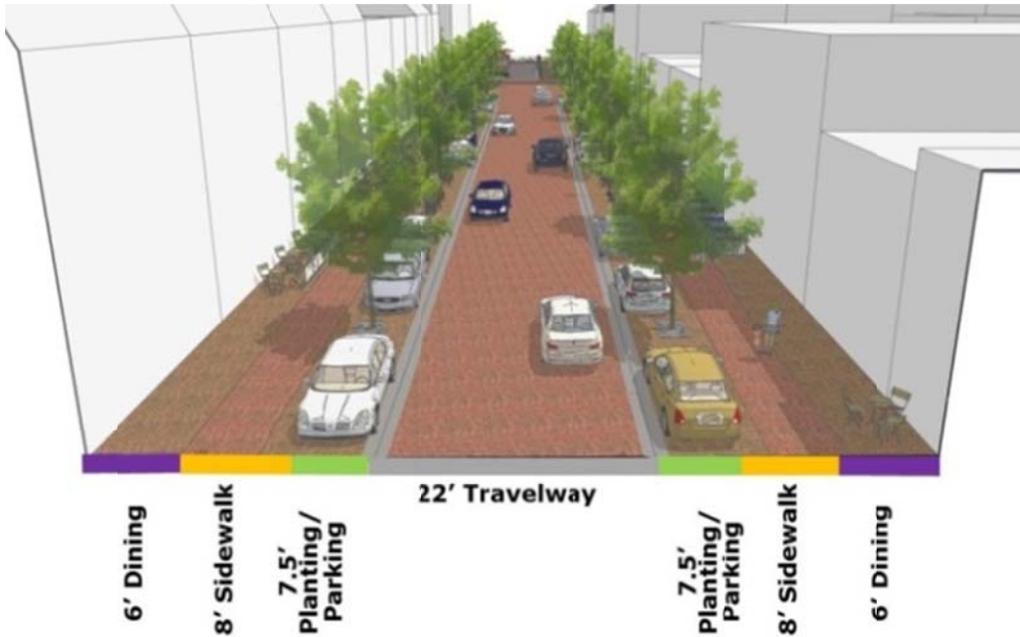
Typical Section of Option 5 - Widened Sidewalks/Some Parking
